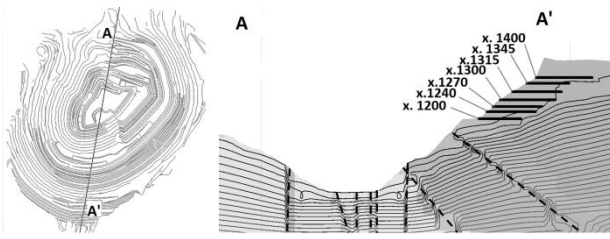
Conceptual drainage system in phyllites and schists with horizontal drainage boreholes from elevation 1200 to 1400 m. The left plot shows a plan of the Ellatzite mine at the end of 2022 with the position of the section shown in the right diagram. The section shows the horizontal drainage boreholes and the isolines of the pore pressure distribution in depth, with difference of 250 kPa, starting from 0 kPa
